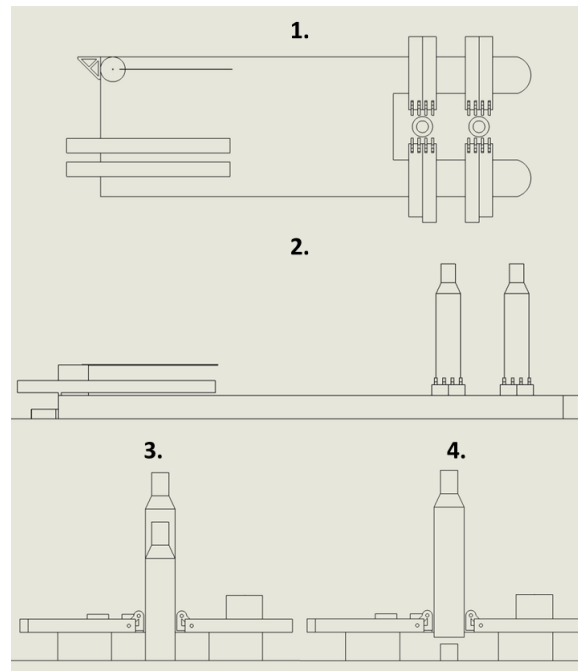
Storyboard visualising the 4 steps for the installation spar foundations with Concept 13
